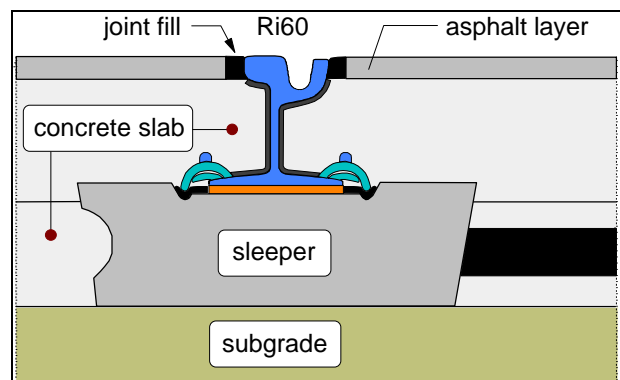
Concrete sleepers used on tram track to speed up construction work
